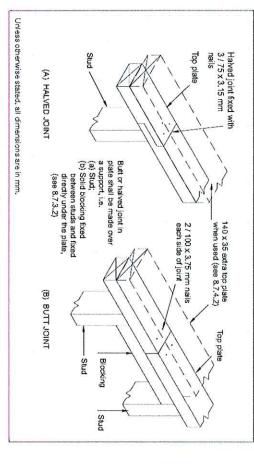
Connecting top plates - Walls not containing bracing (see 8.7.3.2)
